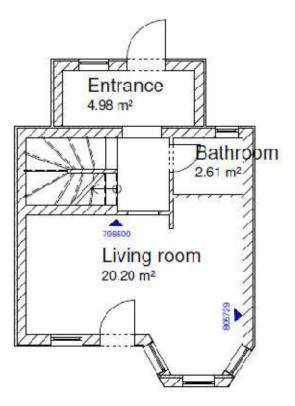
Plan of the ground floor of KLG Hagedorn, House 1 showing the data logger locations
